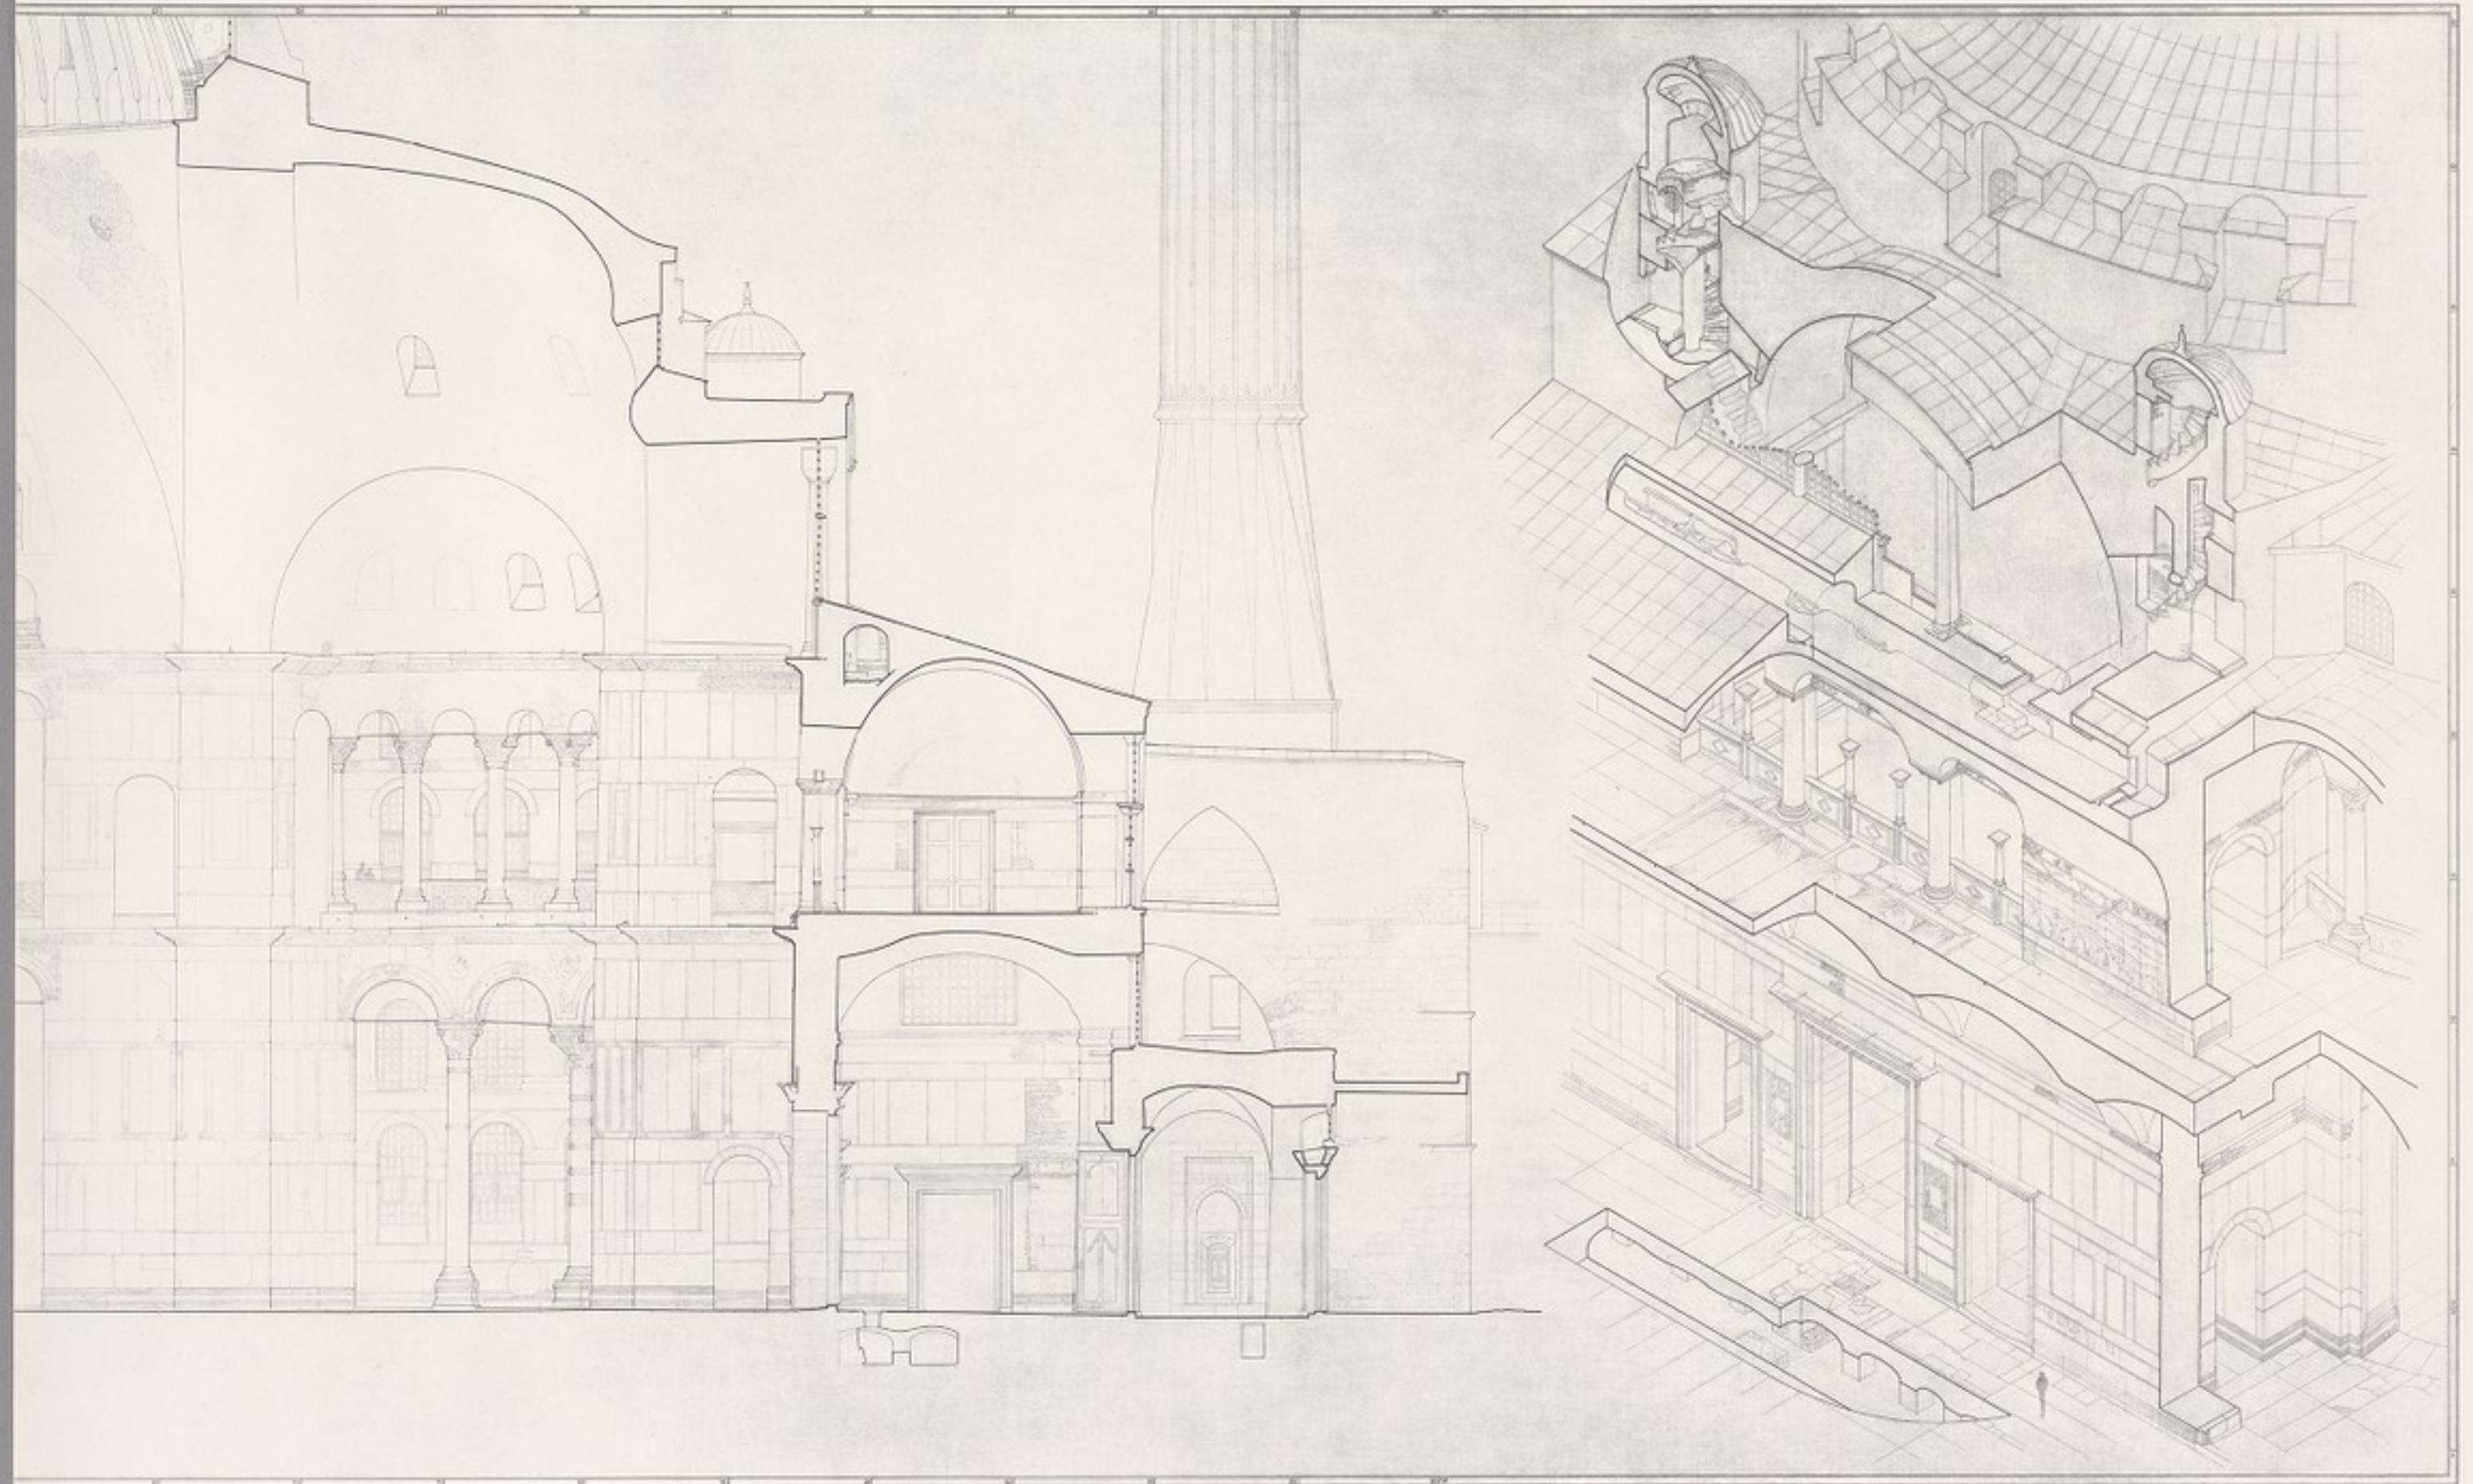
A. LONGITUDINAL SECTION, LOOKING SOUTH
